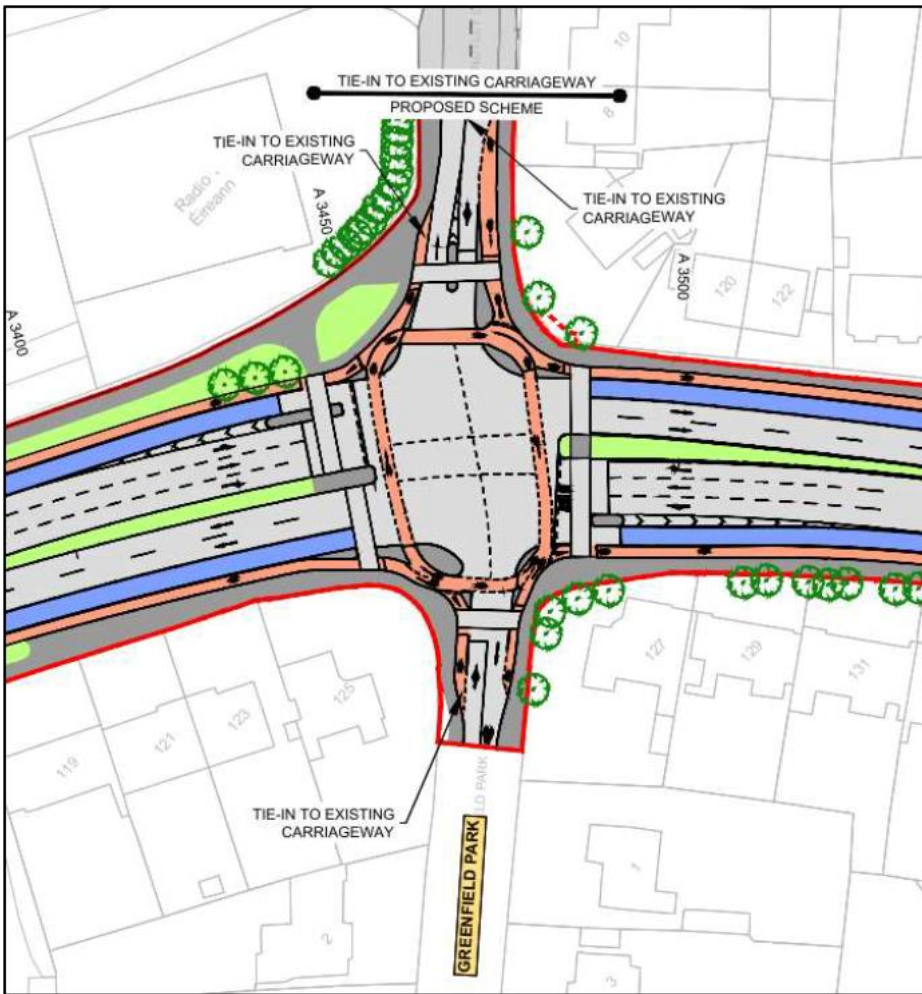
Proposed Scheme Preliminary Design Layout at R138 Stillorgan Road / Nutley Lane Junction, Tying into the Existing Nutley Lane Layout
